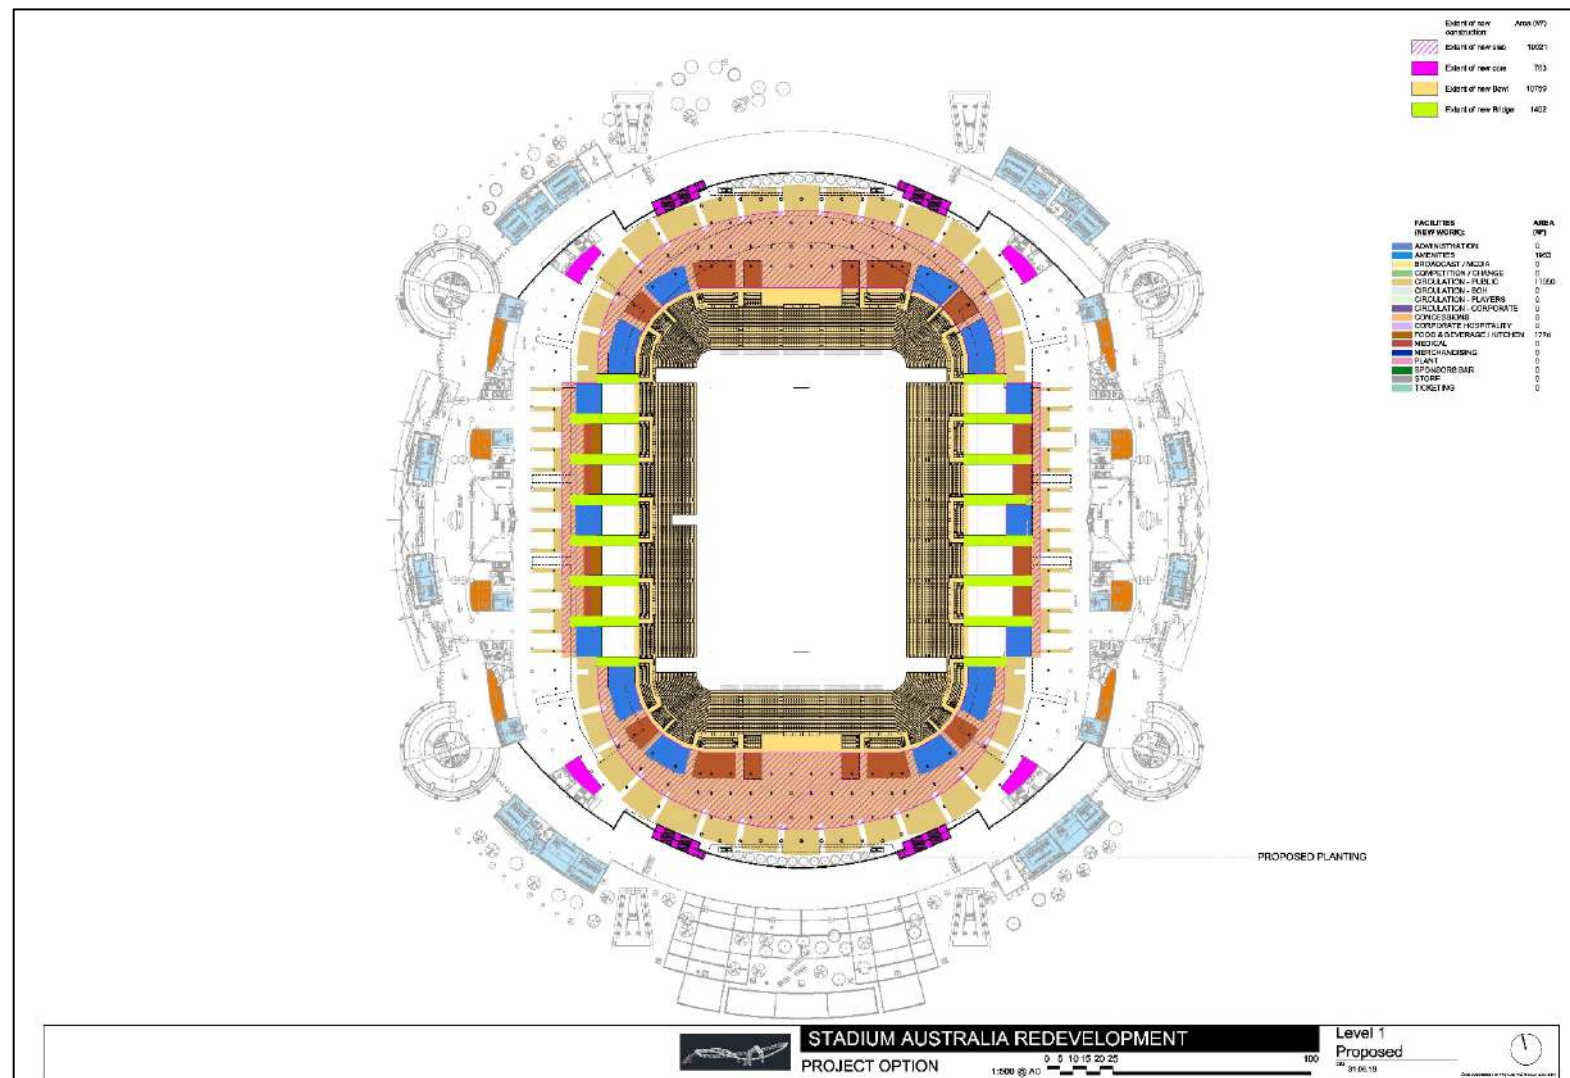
Proposed Level 1 Plan (Source: Cox, 2019)
